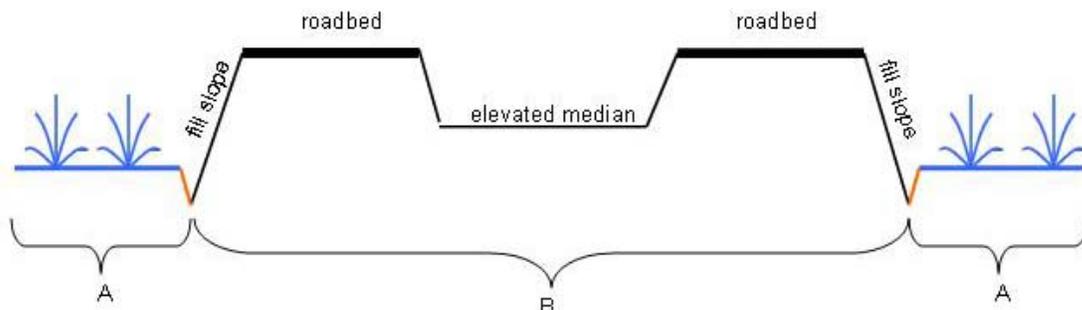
Elevated roadway with an elevated median that was constructed in a jurisdictional wetland.
